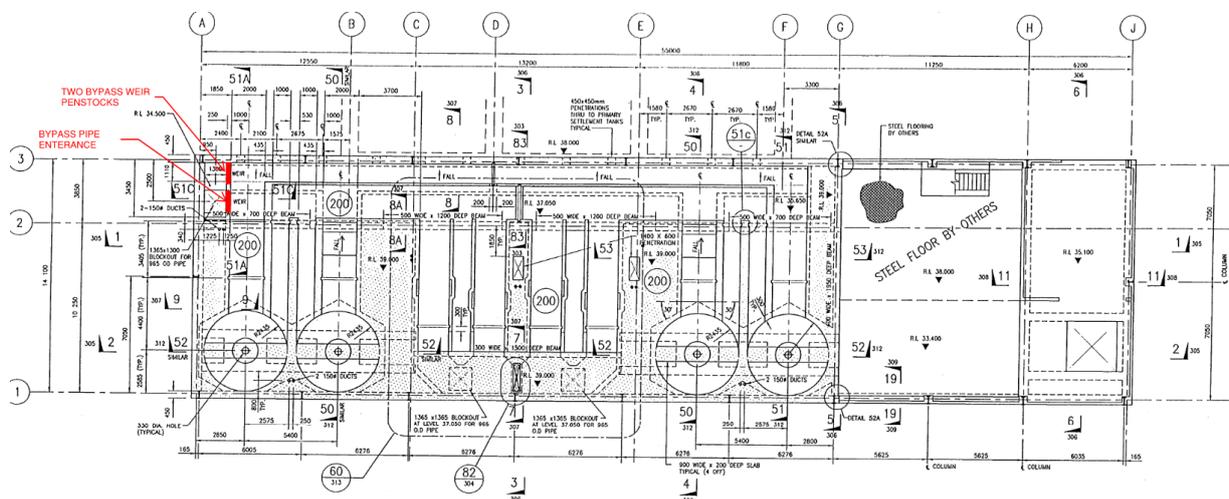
Inlet Works Plan Drawing (Extracted from Moa Pt WWTP Upper Floor Plan As Built 951092_02-303)
